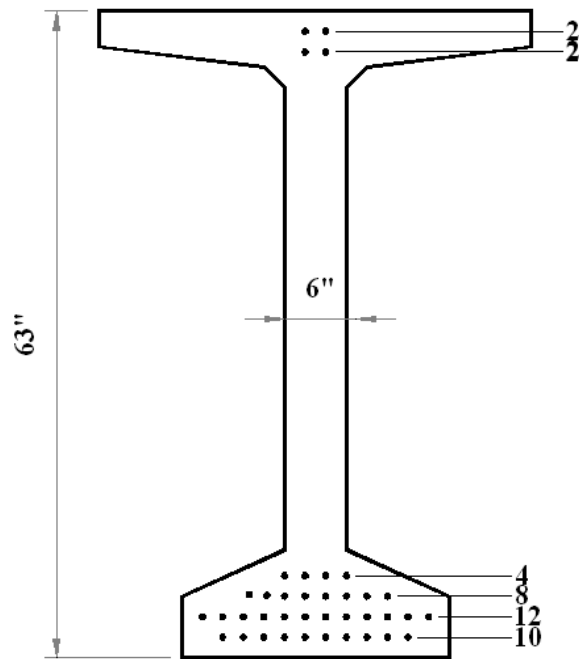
End View Cross-Section of Six BT-63 Girders with 38-0.6 in. (15 mm) Strands Employing UHPC.
